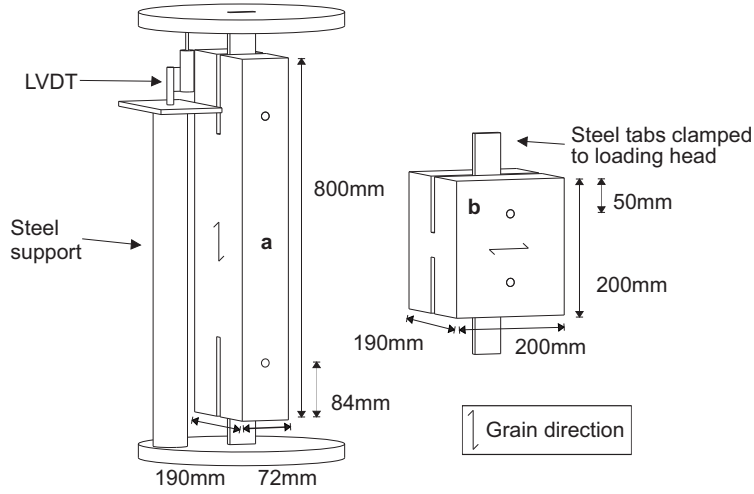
Test setup and specimen dimensions for single-dowel connection tests a parallel to grain and b perpendicular to grain
